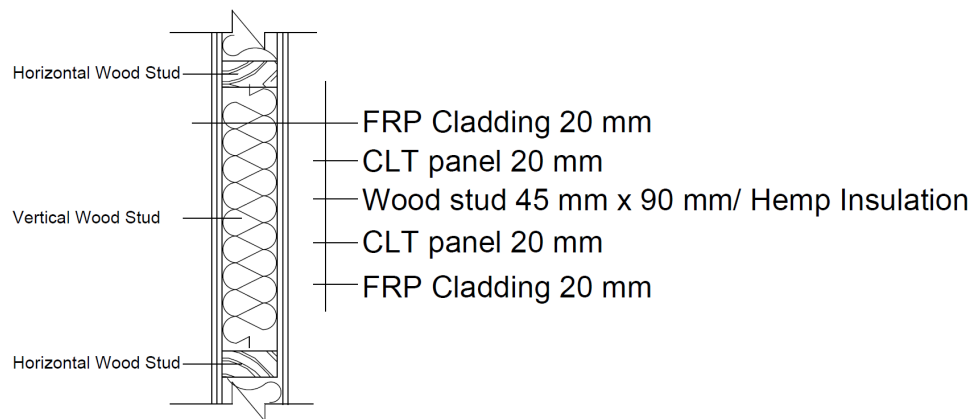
Wall section for the biobased construction interior wall Type 2 and 3.
